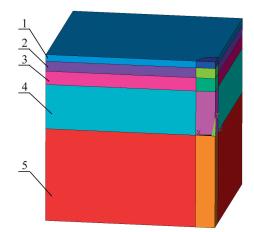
Structural element of the pavement. The layers of the material correspond to the pavement layers shown in Figure 1
